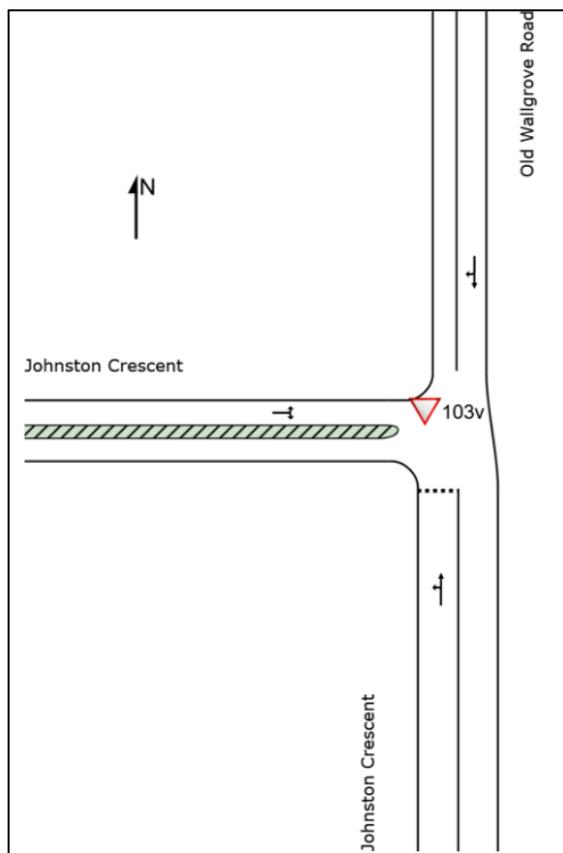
SIDRA Existing Intersection Layout – Old Wallgrove Rd / Johnston Cres
